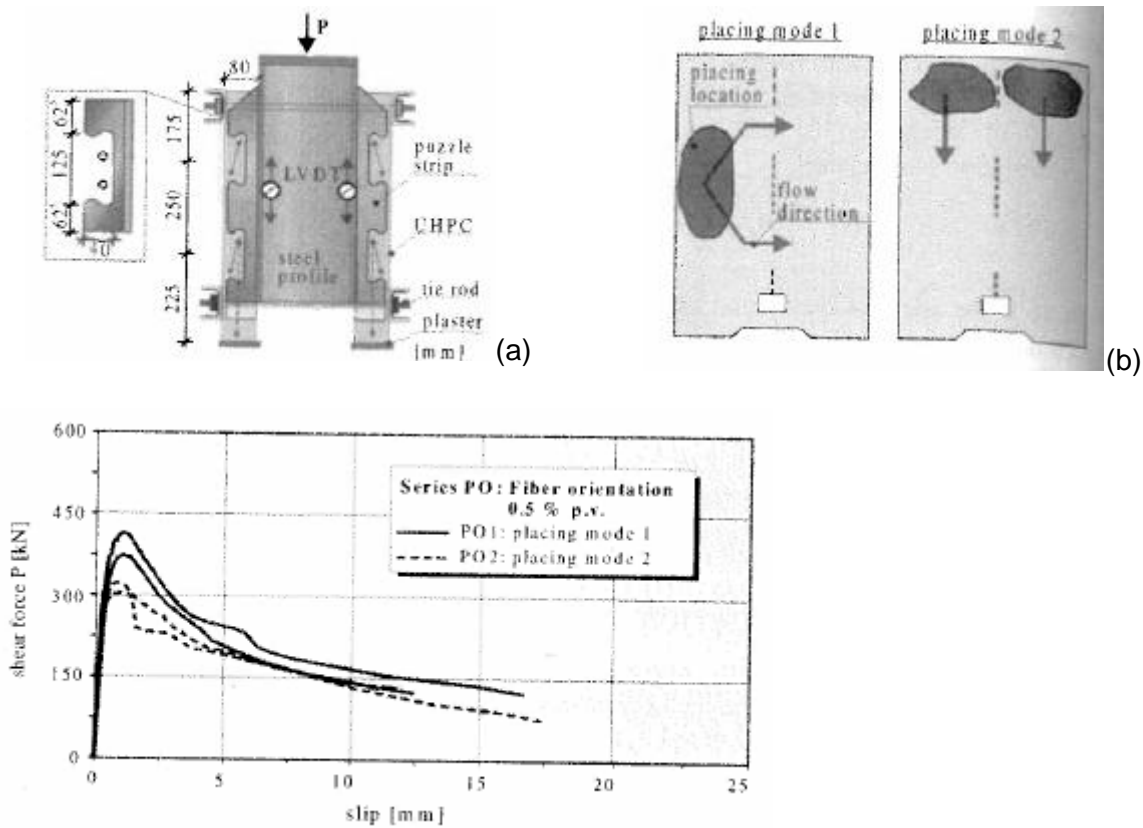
geometry and test set-up of puzzle-strip shear connectors made with SC-HPFRC (a); casting modes (b) and load-slip behaviour
